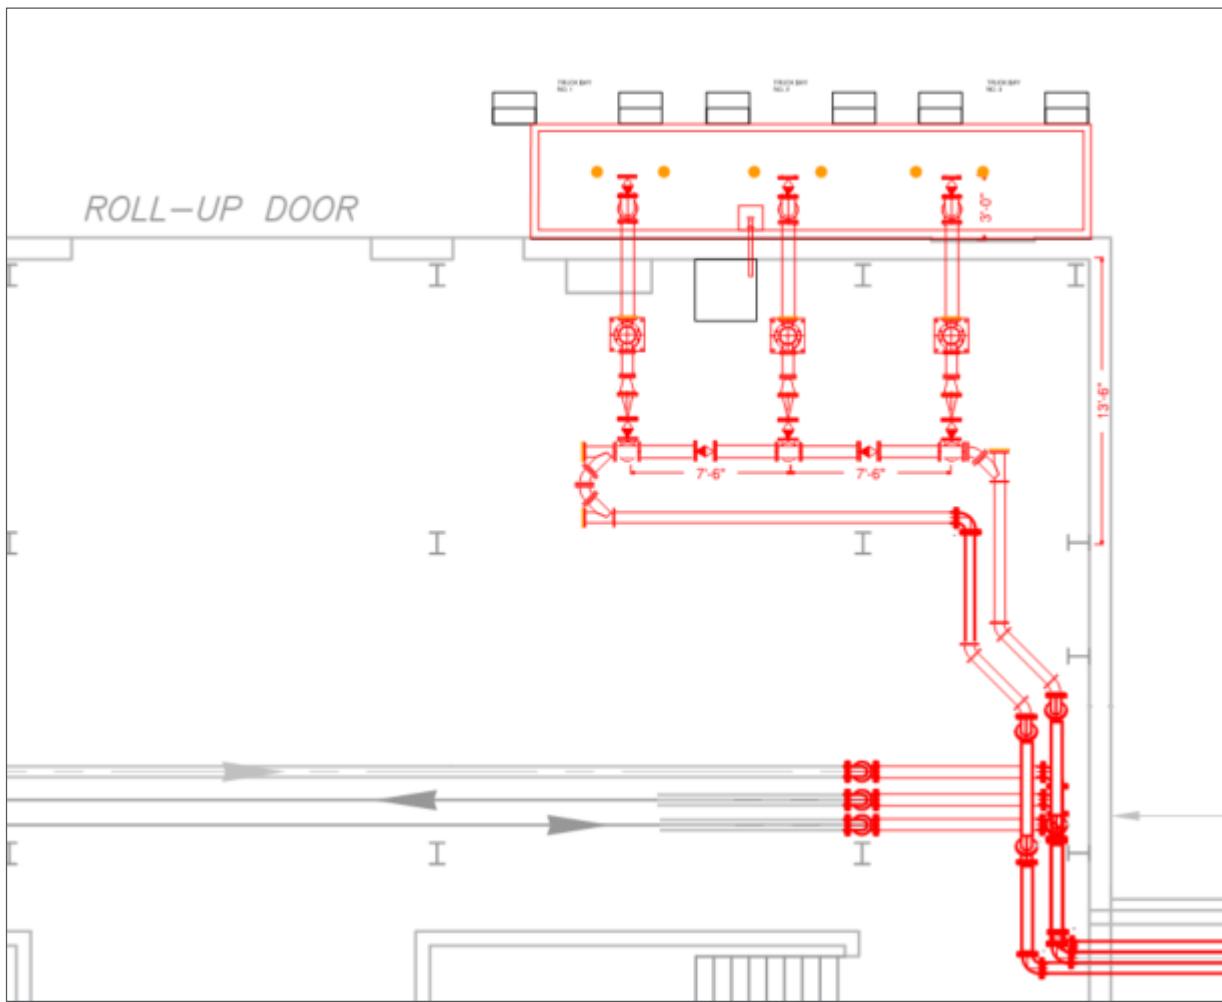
TWAS Structure with Pumps Inside Building 12 (ALT 4)
